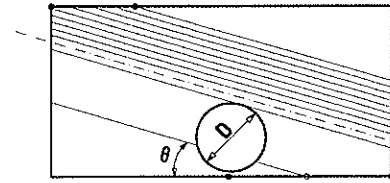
Eccentrically located opening partly inside a tension field
